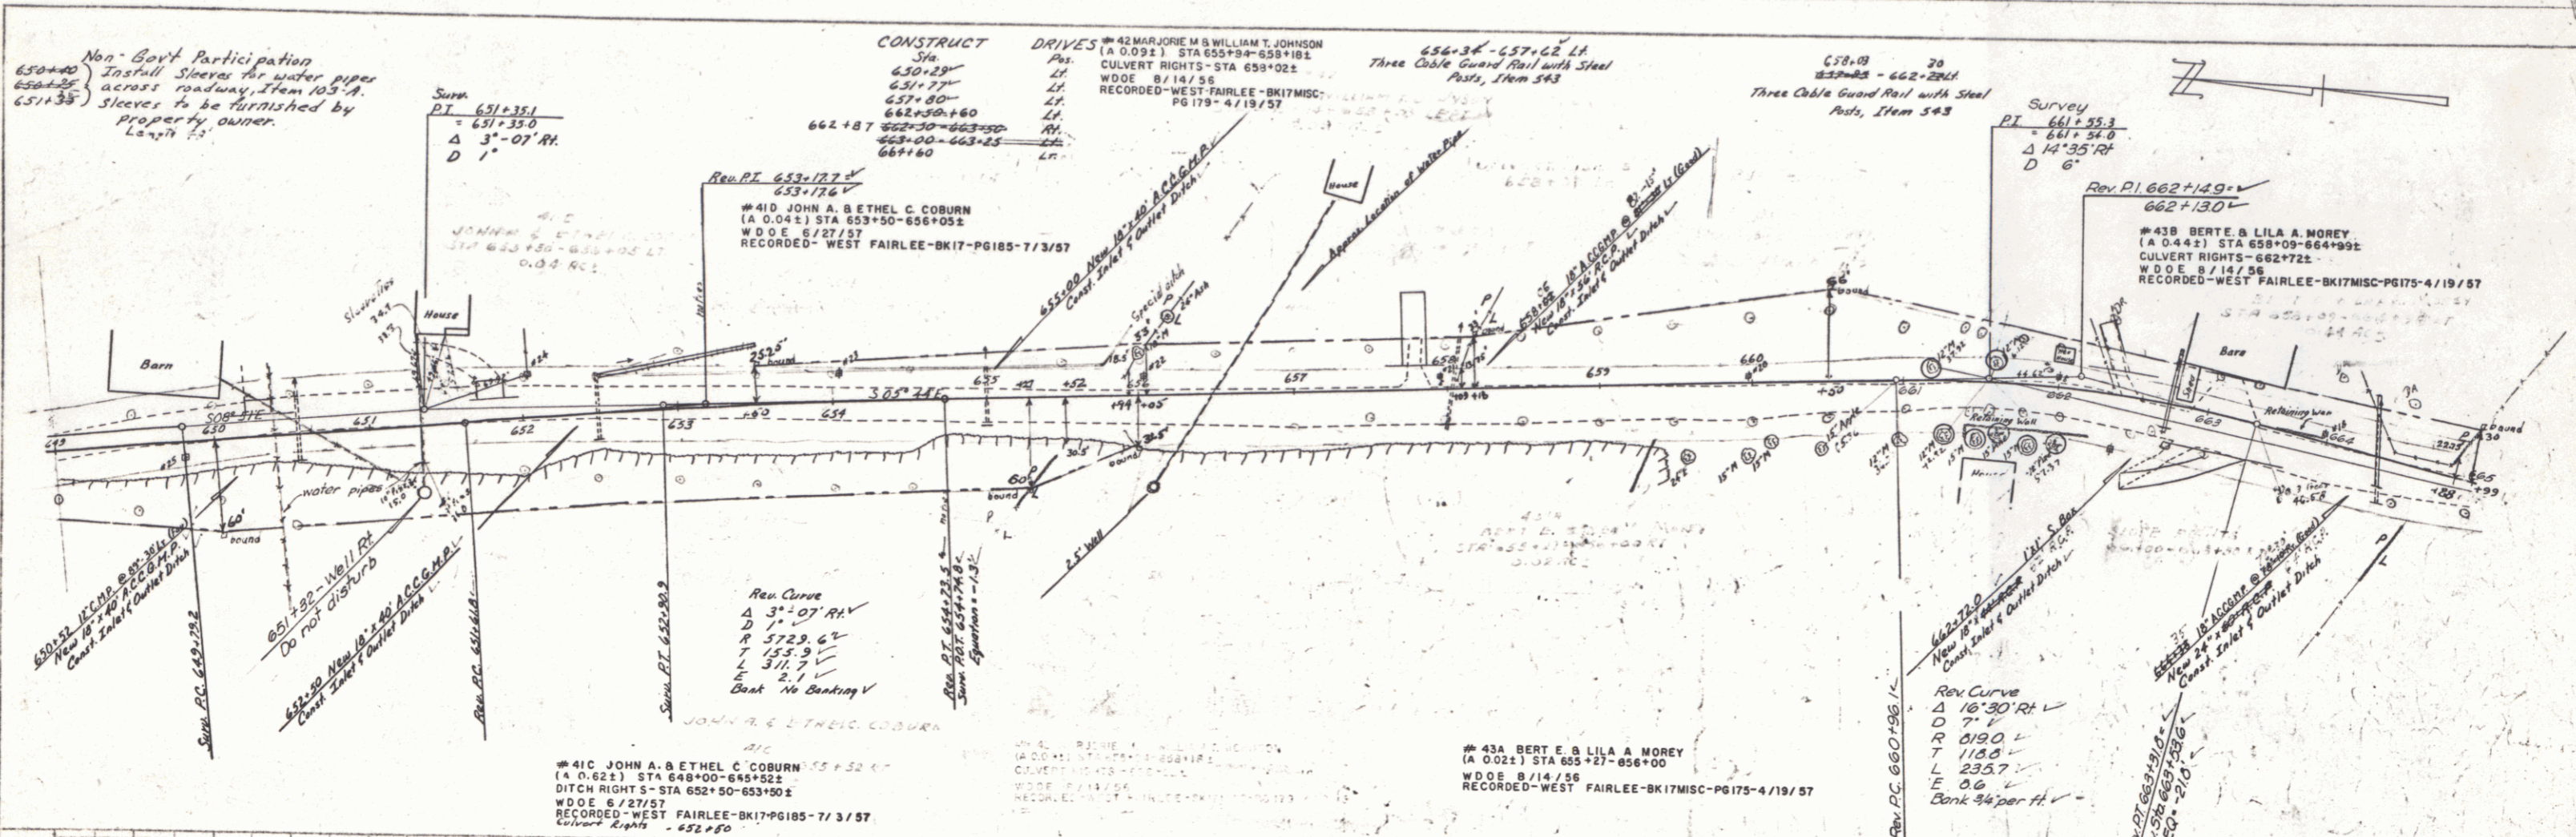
PROFILE 6-4-1-A DRAWING
